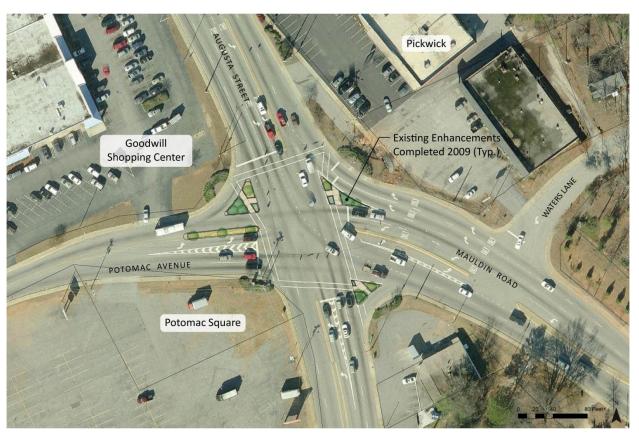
Augusta-Mauldin Gateway Existing Intersection
